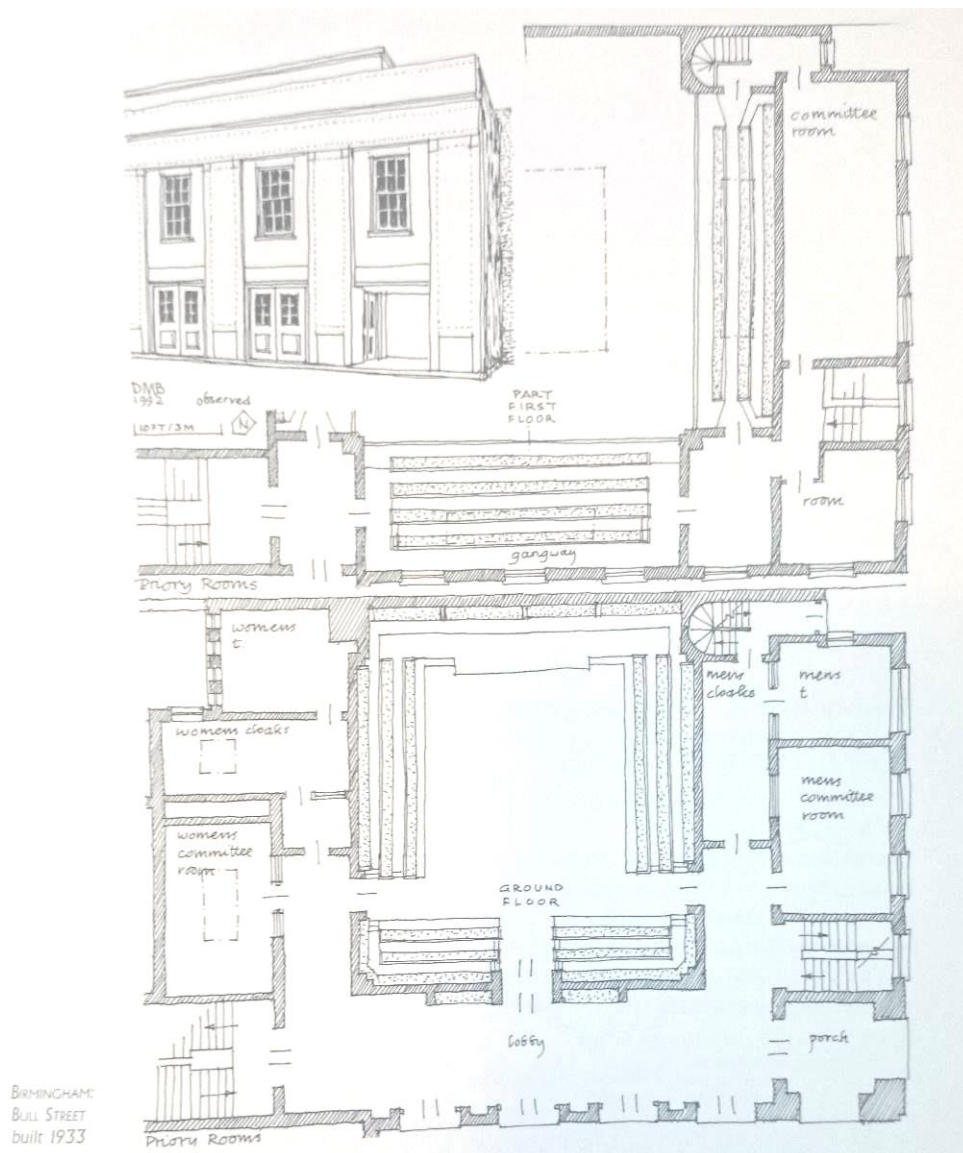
Lower floor plans of the meeting house as reconstructed by Butler (north is at the bottom left; not to scale) (Butler (1999), vol. 2, p.621)
